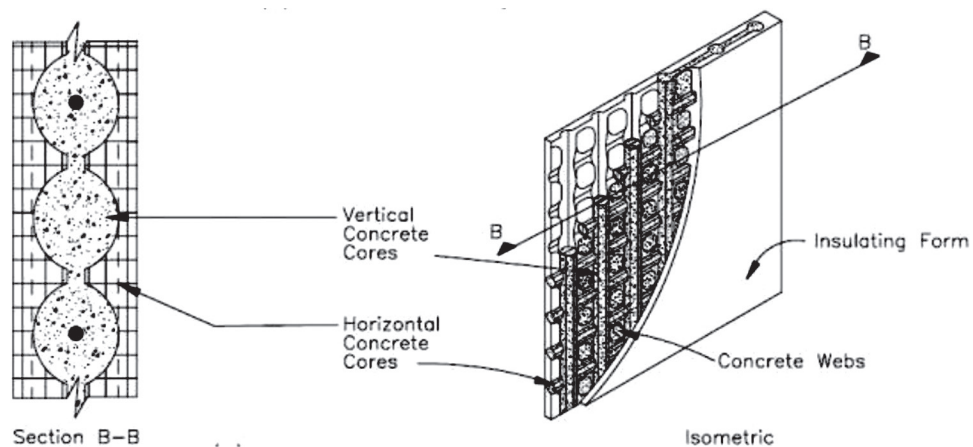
Waffle grid ICF wall system and plan view Section B-B.
